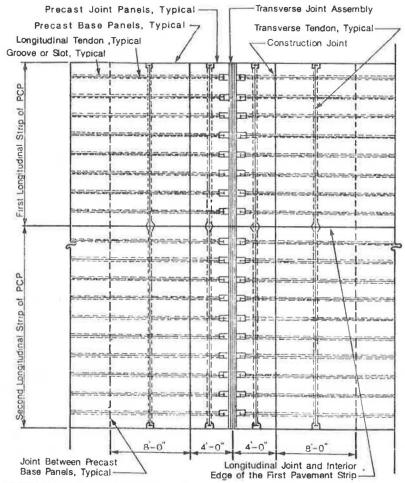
Composite prestressed concrete pavement Type II (CPCPII).
